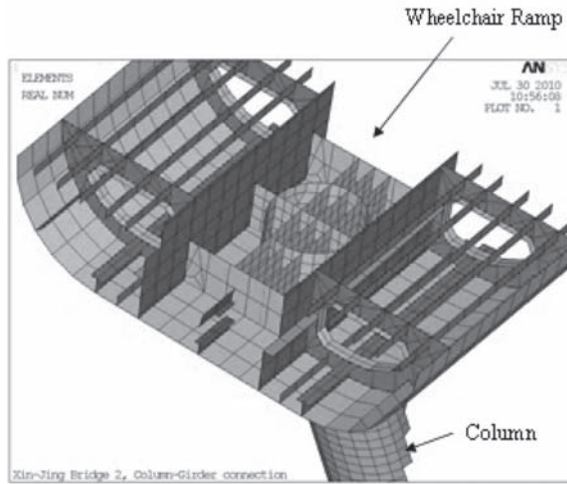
Internal details of model at intersection of cut section and wheelchair ramp.
